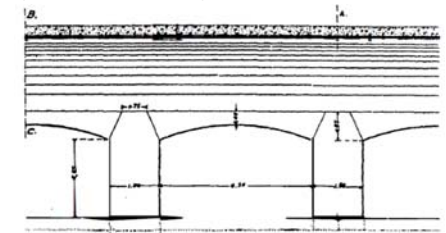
Abutment lightening in tunnels. Longitudinal section (above) and cross-sections (below) (Mendizábal, 1926)
